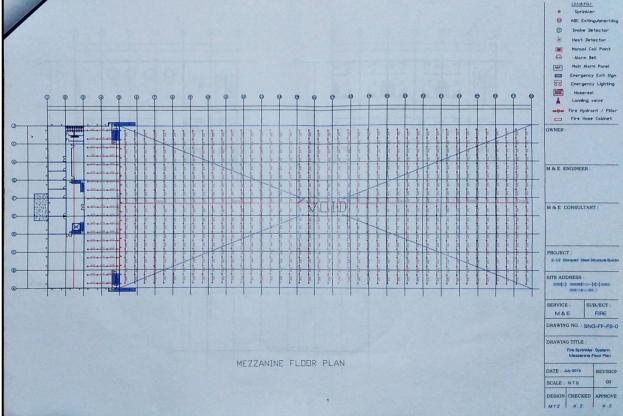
Fire Sprinkler System and Fire Prevention System in Garment Factory (Jade Blue)
